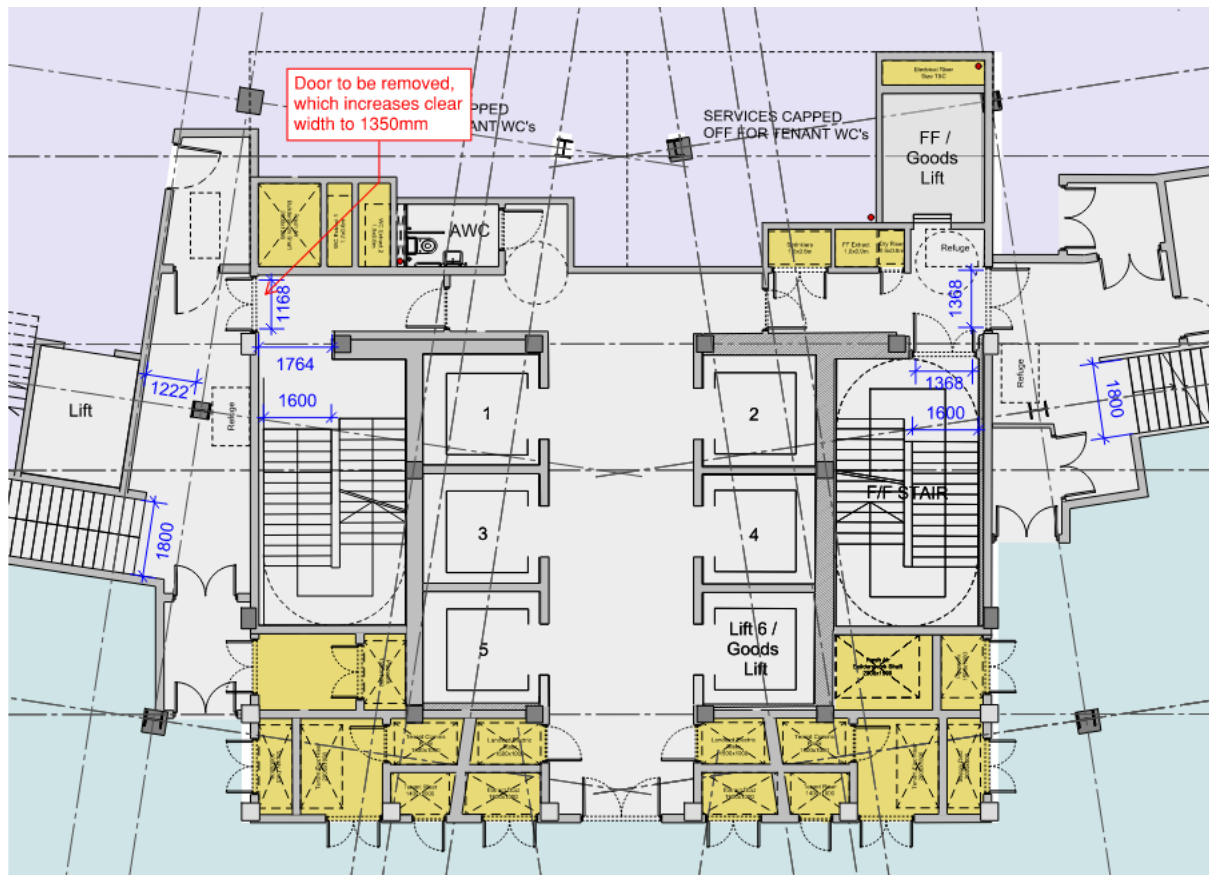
Arrangements limiting the stair clear widths (Note: these arrangements are not currently shown on the GA plans but will be incorporated into the design.)
